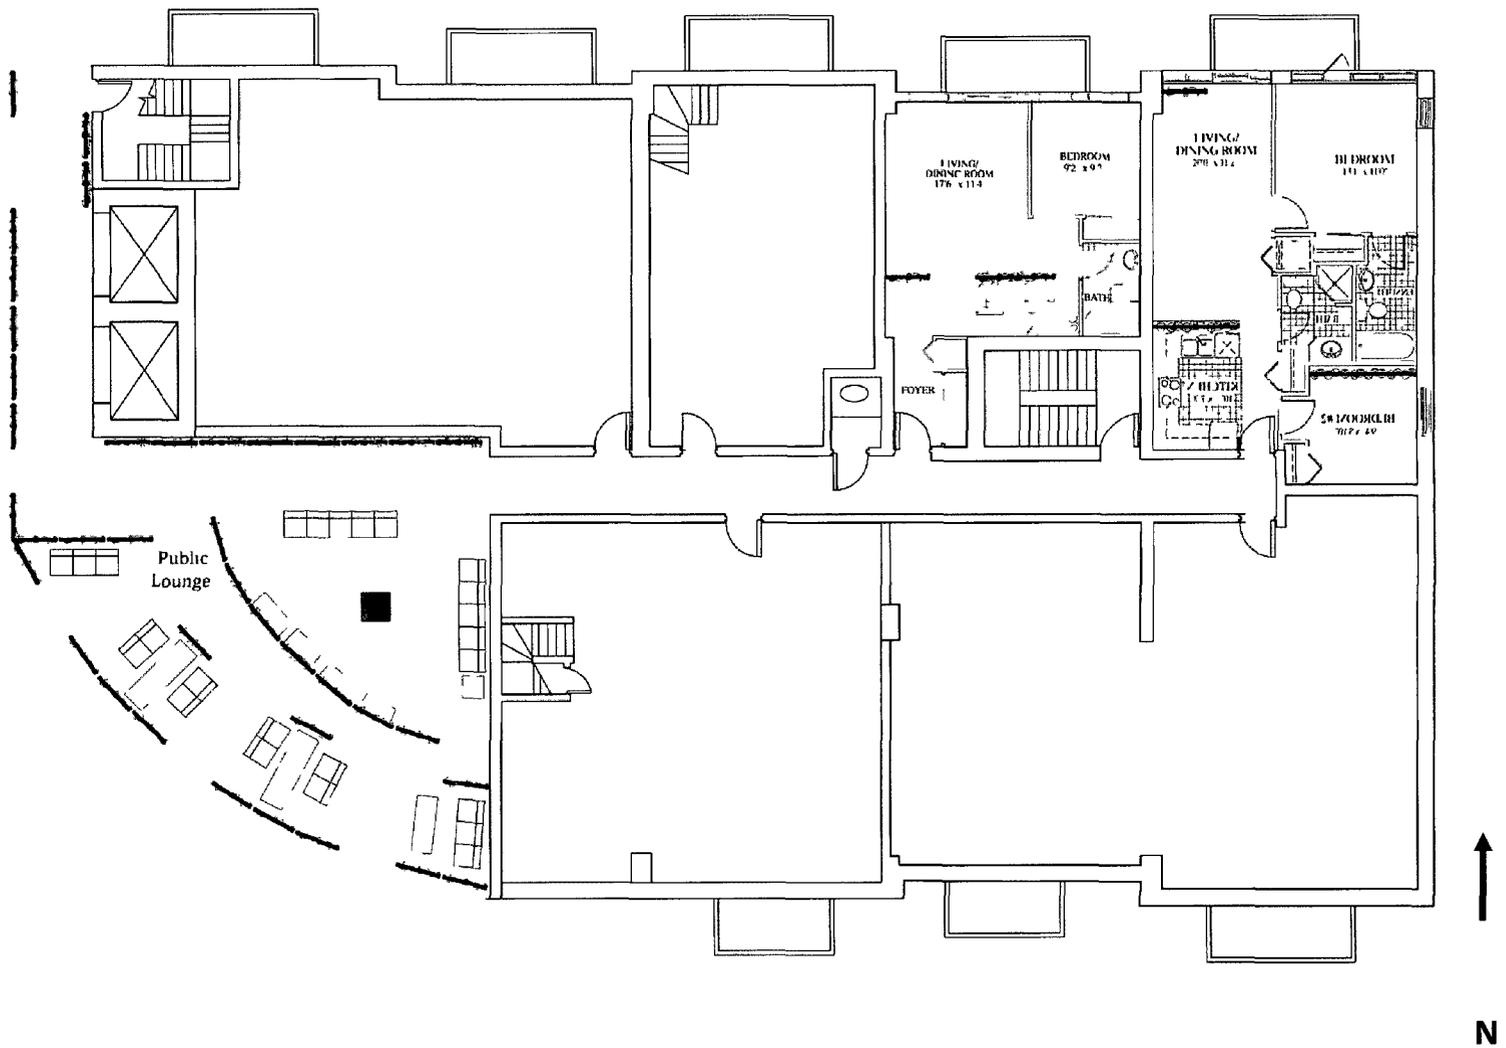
Floor plan of apartment building with possible screen integration placements
